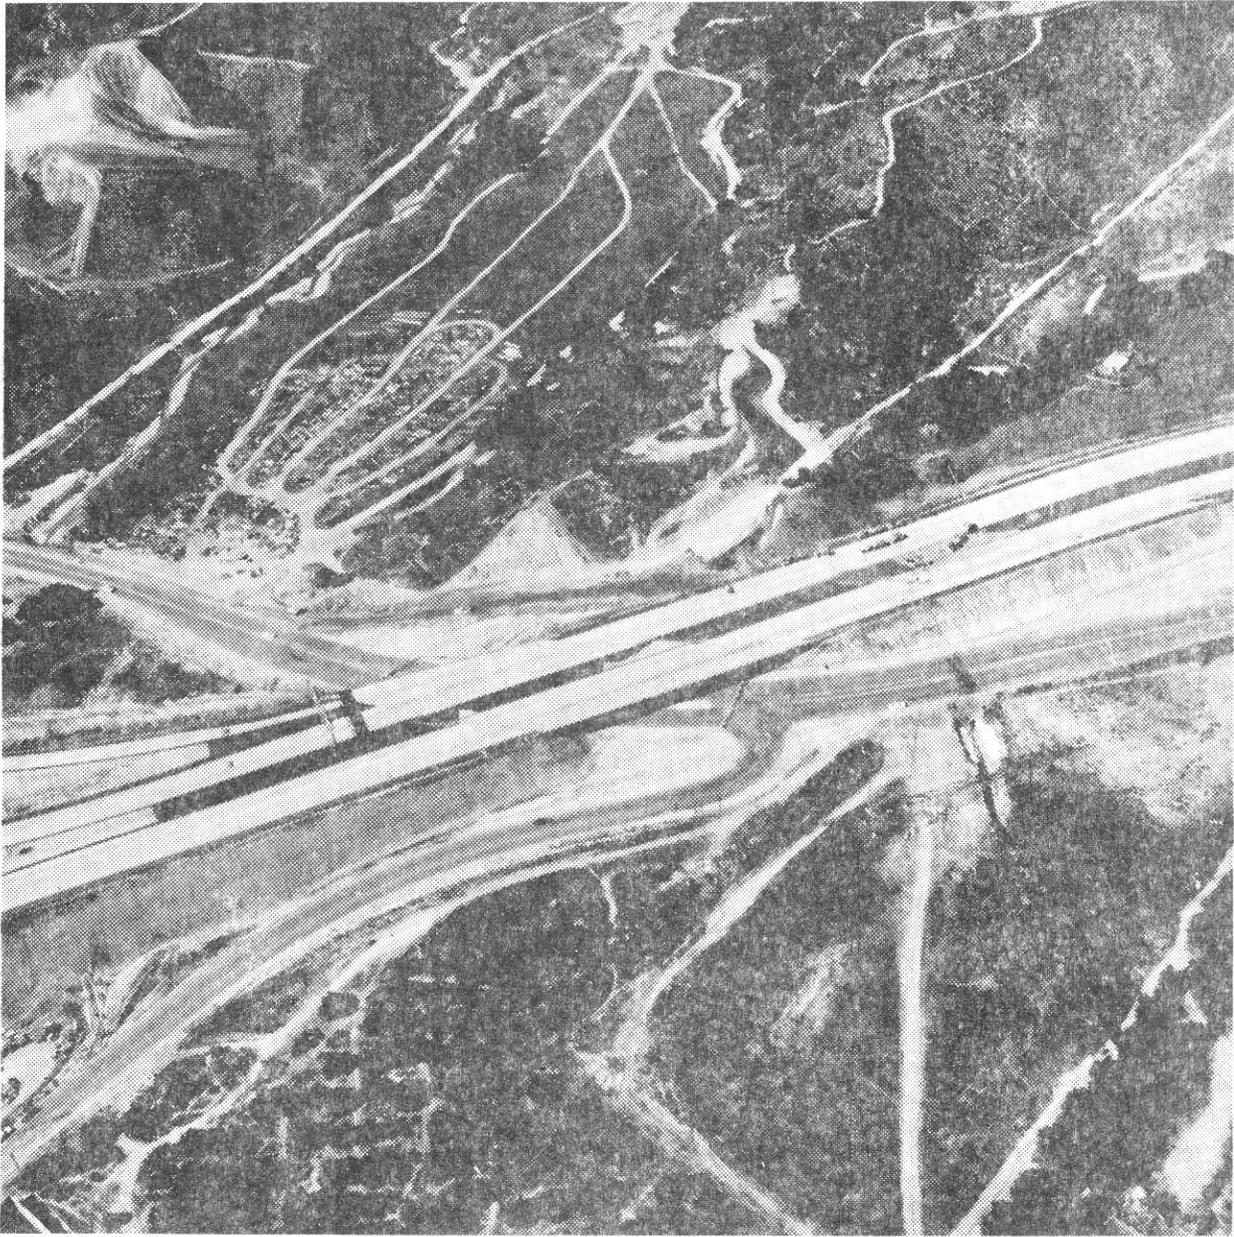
Looking northerly at the Foothill Boulevard Undercrossing.
